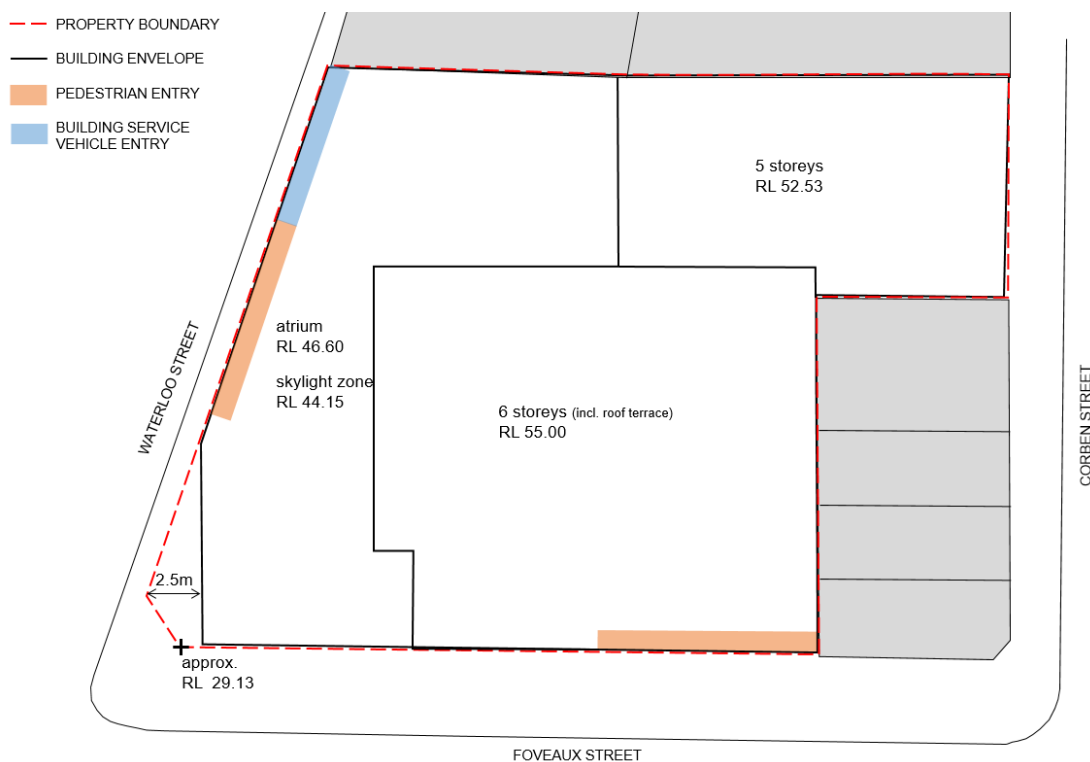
XX: 72-84 Foveaux Street – Structure plan
